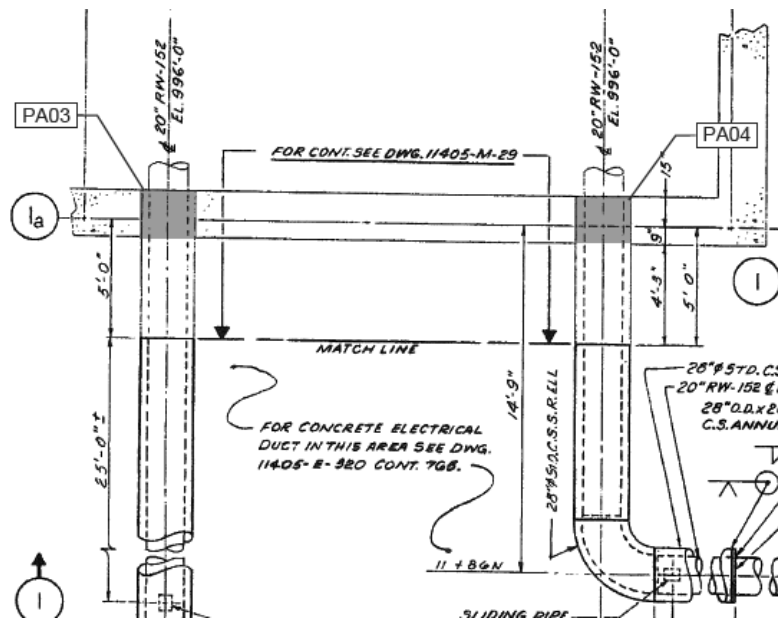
Raw Water Penetrations at Room 19 South Wall, Plan View (10753)
